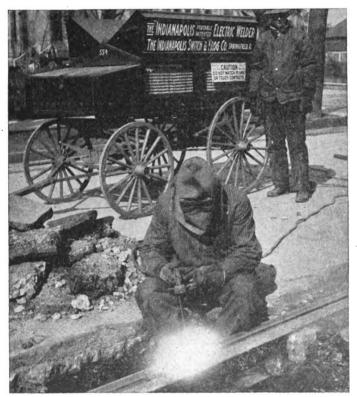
Portable Electric Welder in Action Courtesy of Indianapolis Switch and Frog Company
